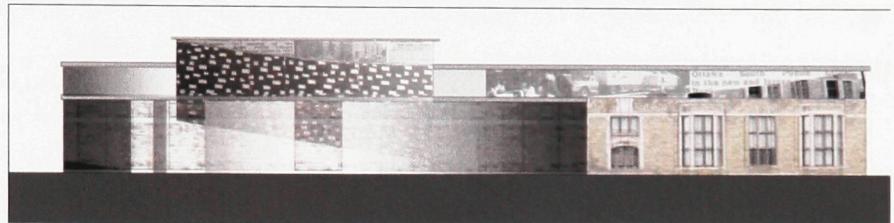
Street Elevation indicating the various rooflines. Rebecca Han, 2011
